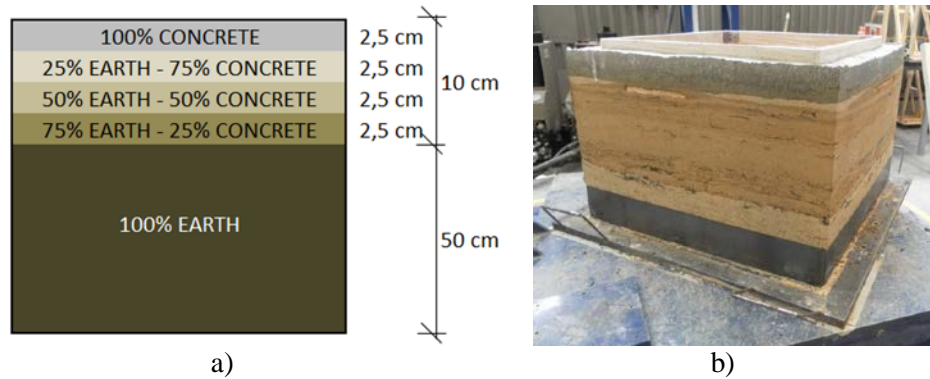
a) Scheme of the smooth transition between the walls and the upper concrete beam and b) Scaled building model with the transition to the concrete upper beam at the top of the wall confinement wood elements
